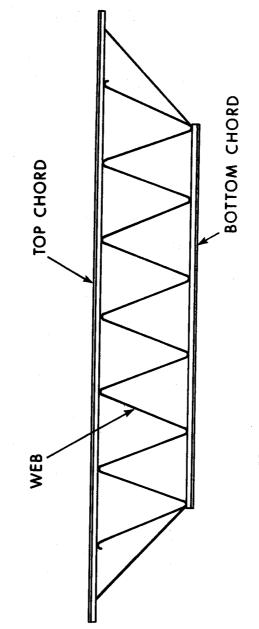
TYPICAL OPEN WEB STEEL JOIST
